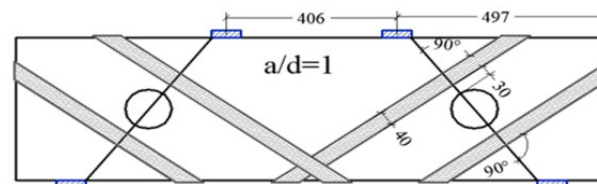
Details of strengthened deep beam with openings (DO-1-I)
